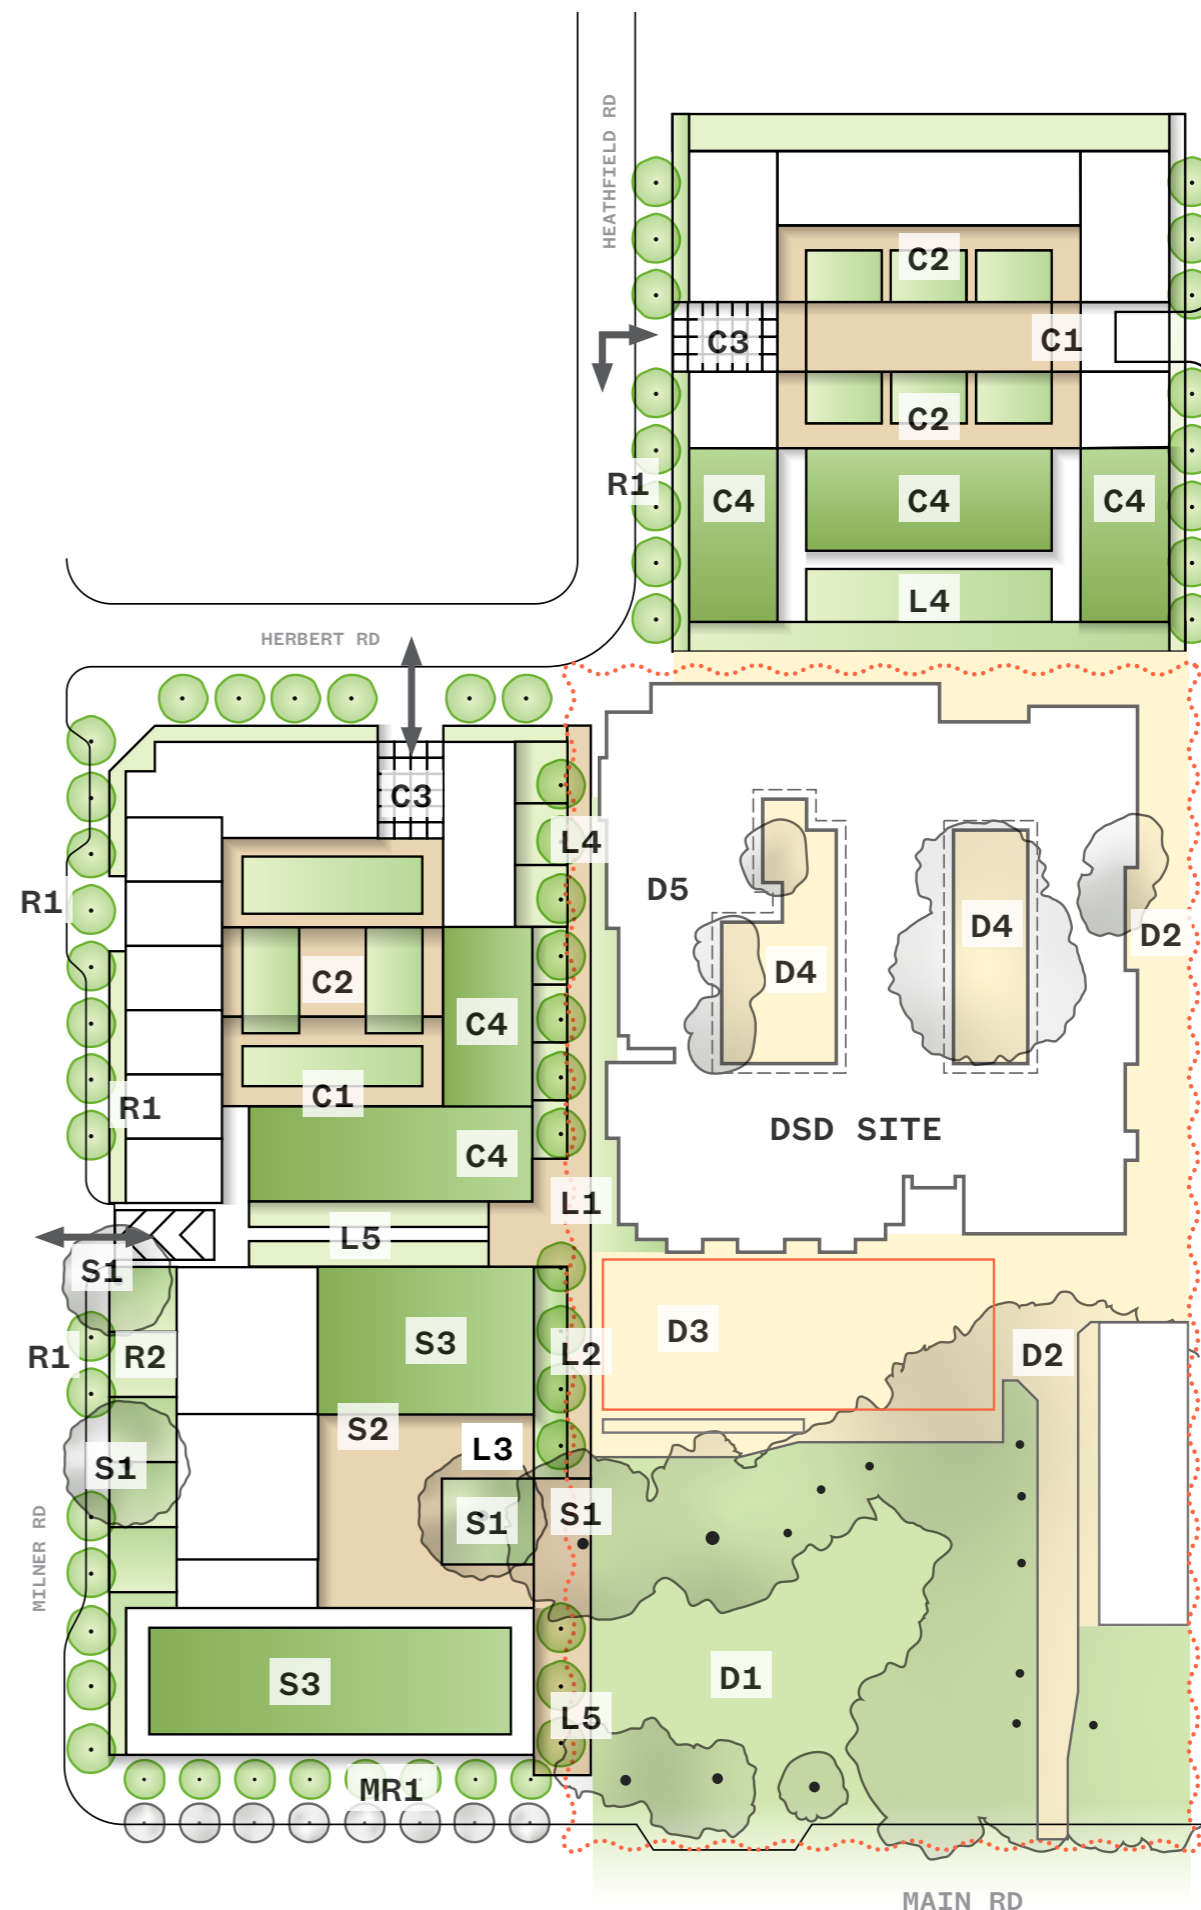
Integrated Landscape Framework Plan (Square One, 2026c: 23)
